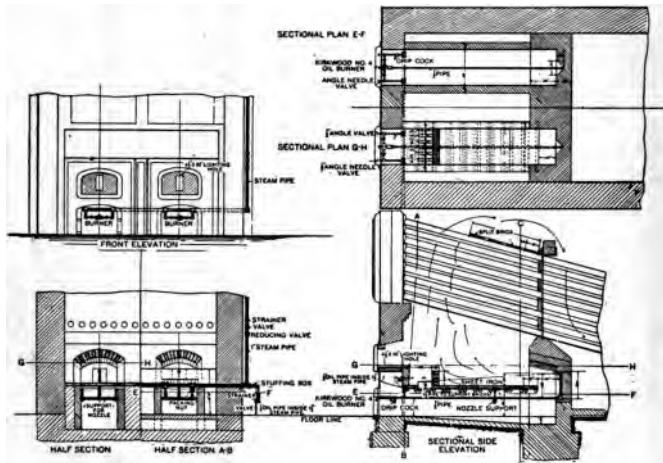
Setting for No. 4 Kirkwood Burner Under Water Tube Boilers.
